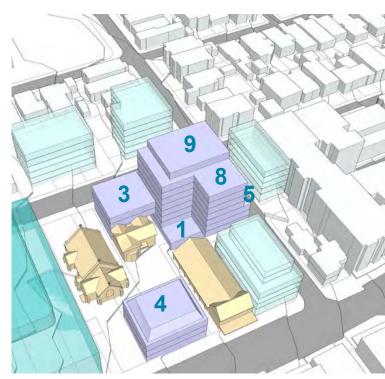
Perspective view: SGL scheme with proposed building heights in storeys
